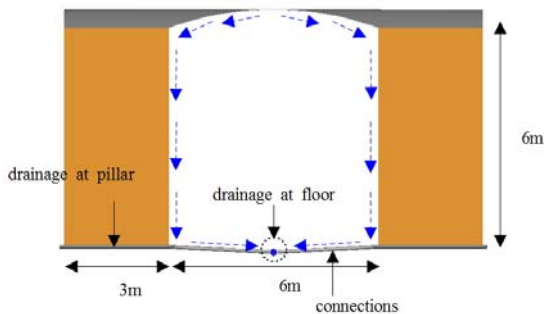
Assumed unit shape of room-and-pillar underground structure
